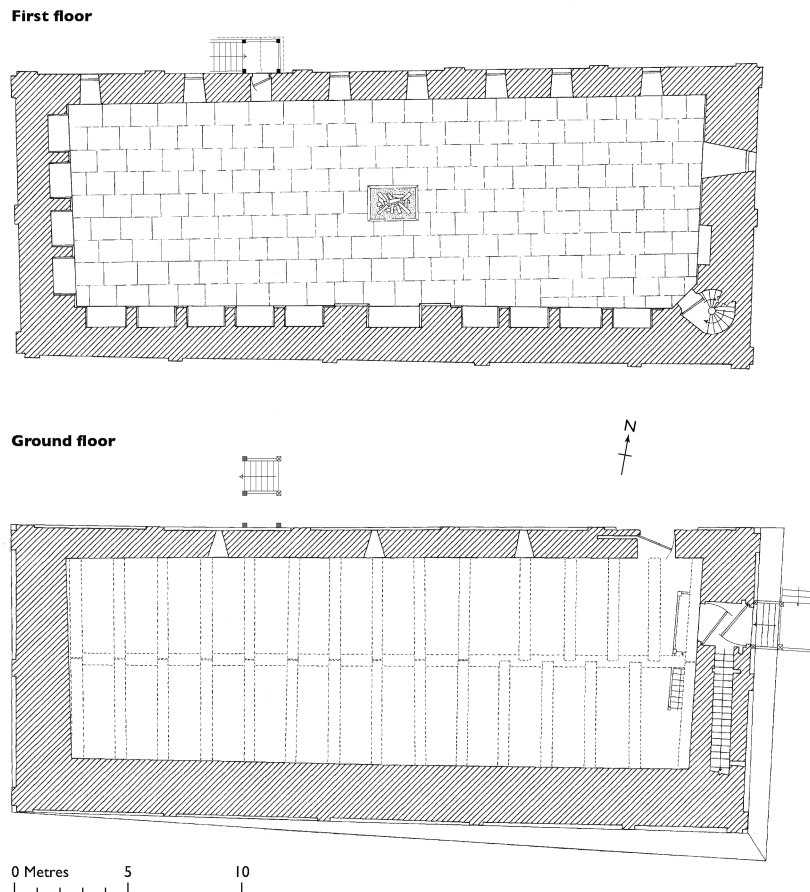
Reconstruction of the original ground and first floor plans of the late eleventh-century great tower at Chepstow (Drawing: R. Turner. Cadw, Welsh Assembly Government, Crown Copyright).
